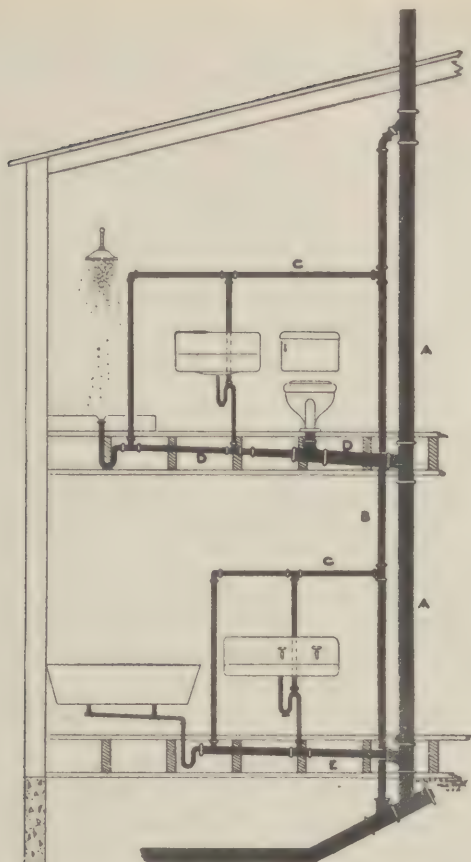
A plumbing system for barracks (Schematic). A—Drainage stacks. B—Vent stack. C—Vent pipes. D—Soil pipes. E—Waste pipes.
